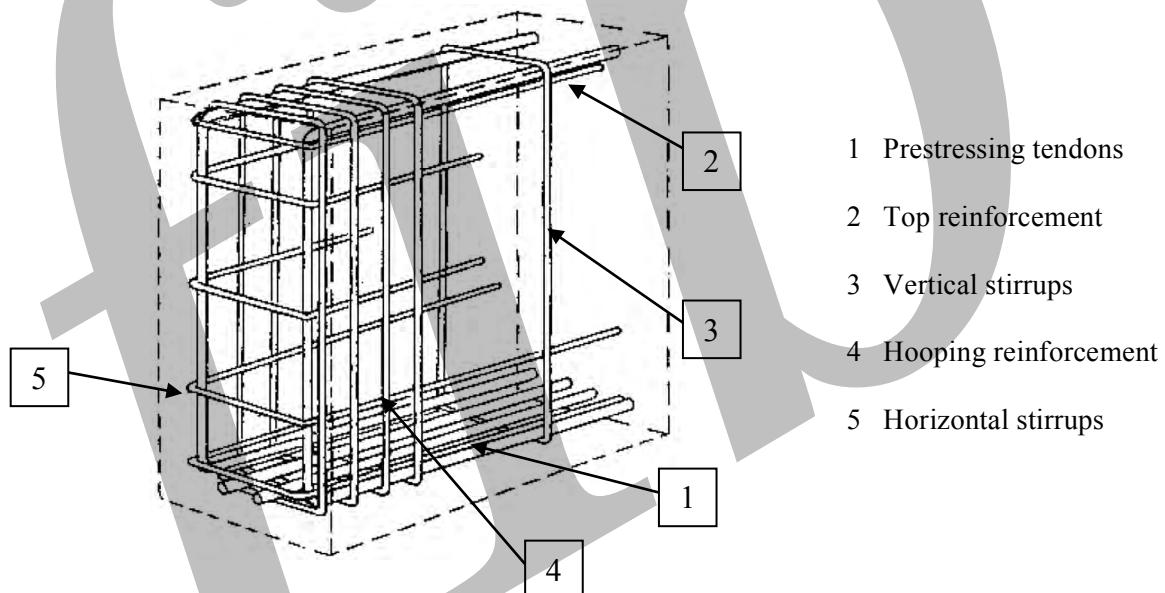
Arrangement of the reinforcement in the end zone of a prestressed beam
